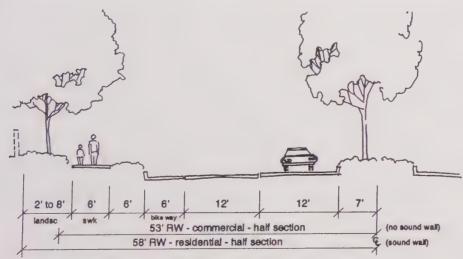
STREET SECTIONS - Commercial Collectors
